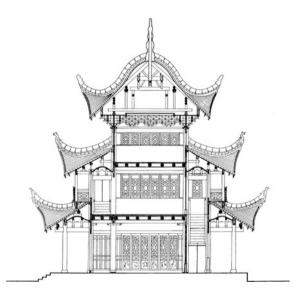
Section drawing of the Yueyang Tower. The roof is of Column-and-tie construction, with upturned eaves. Within, four gold-painted camphor wood pillars and four additional gold-painted columns on the second floor support the weight of the structure. *Source* Yang (1993: 181). *Note* Column-and-tie construction is a typical style of traditional Chinese timber structures in which columns and beams are connected by mortise and tenon joints.
